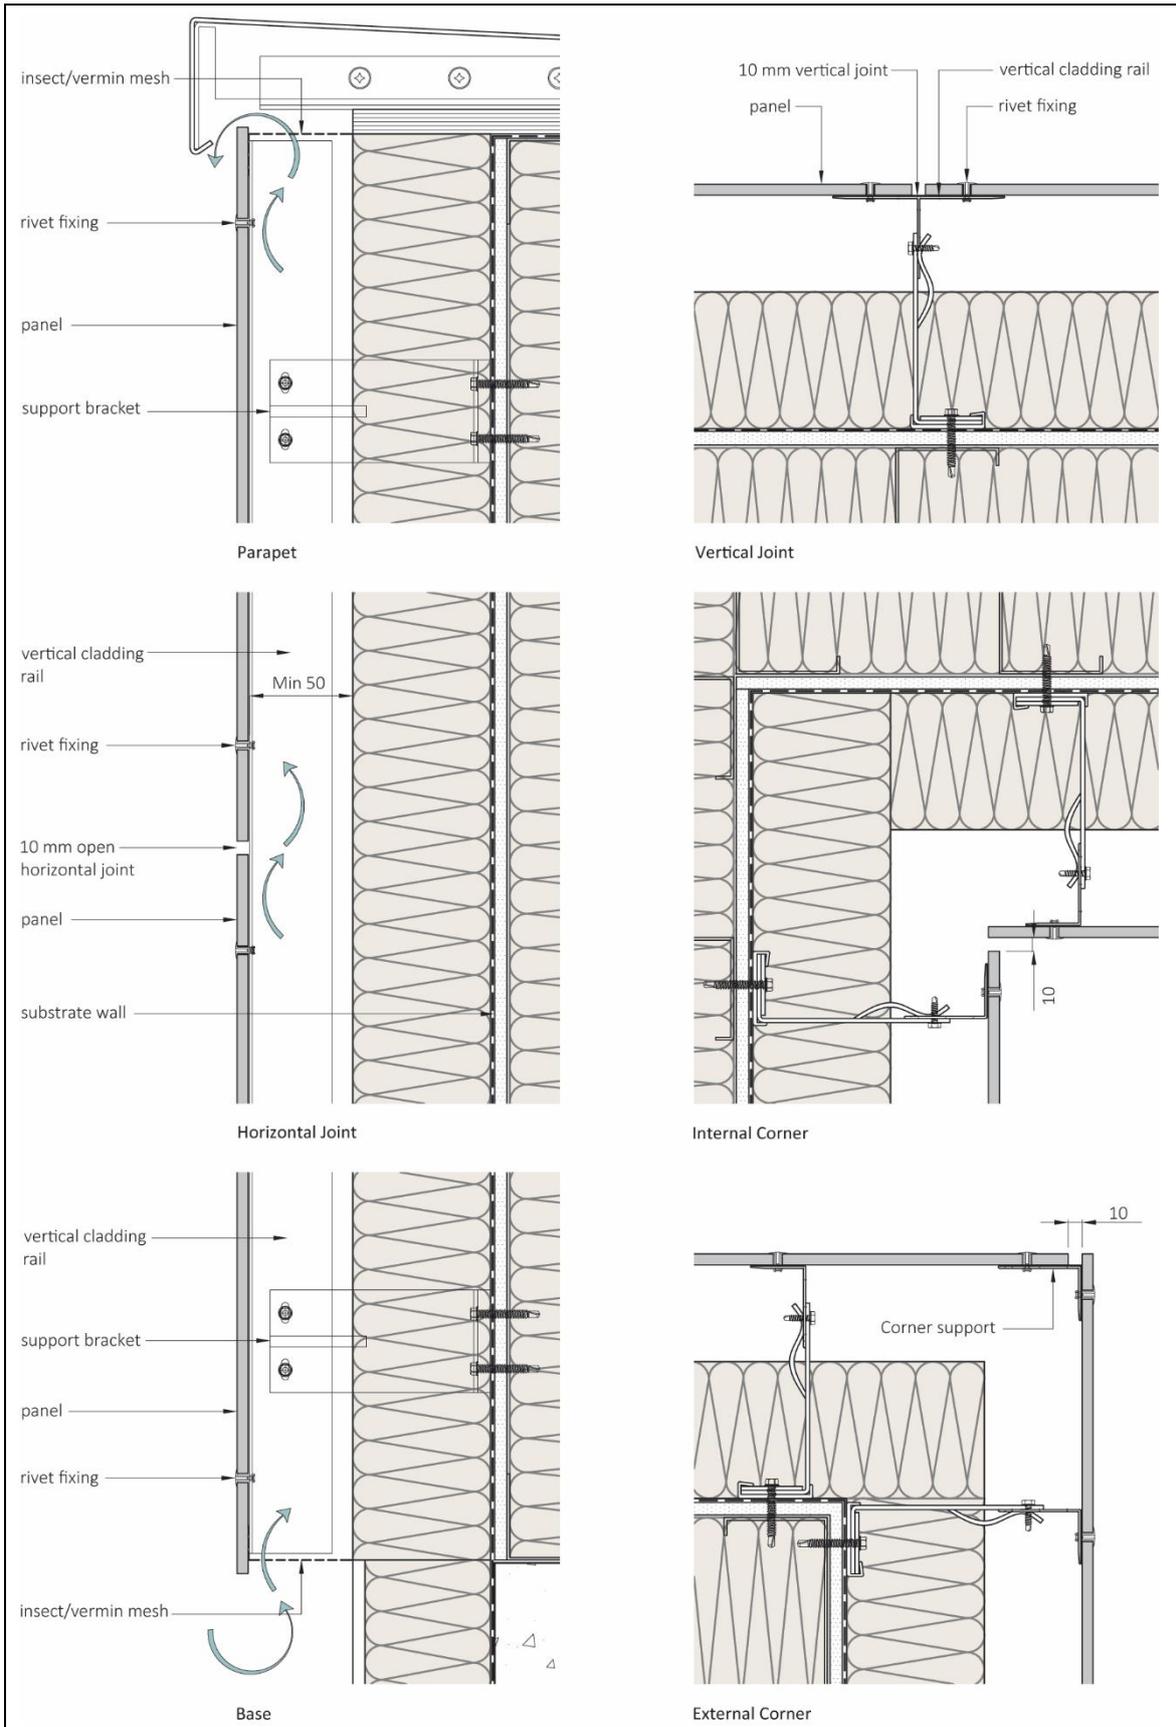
Typical installation details (continued) - rivet fixing and aluminium subframe
